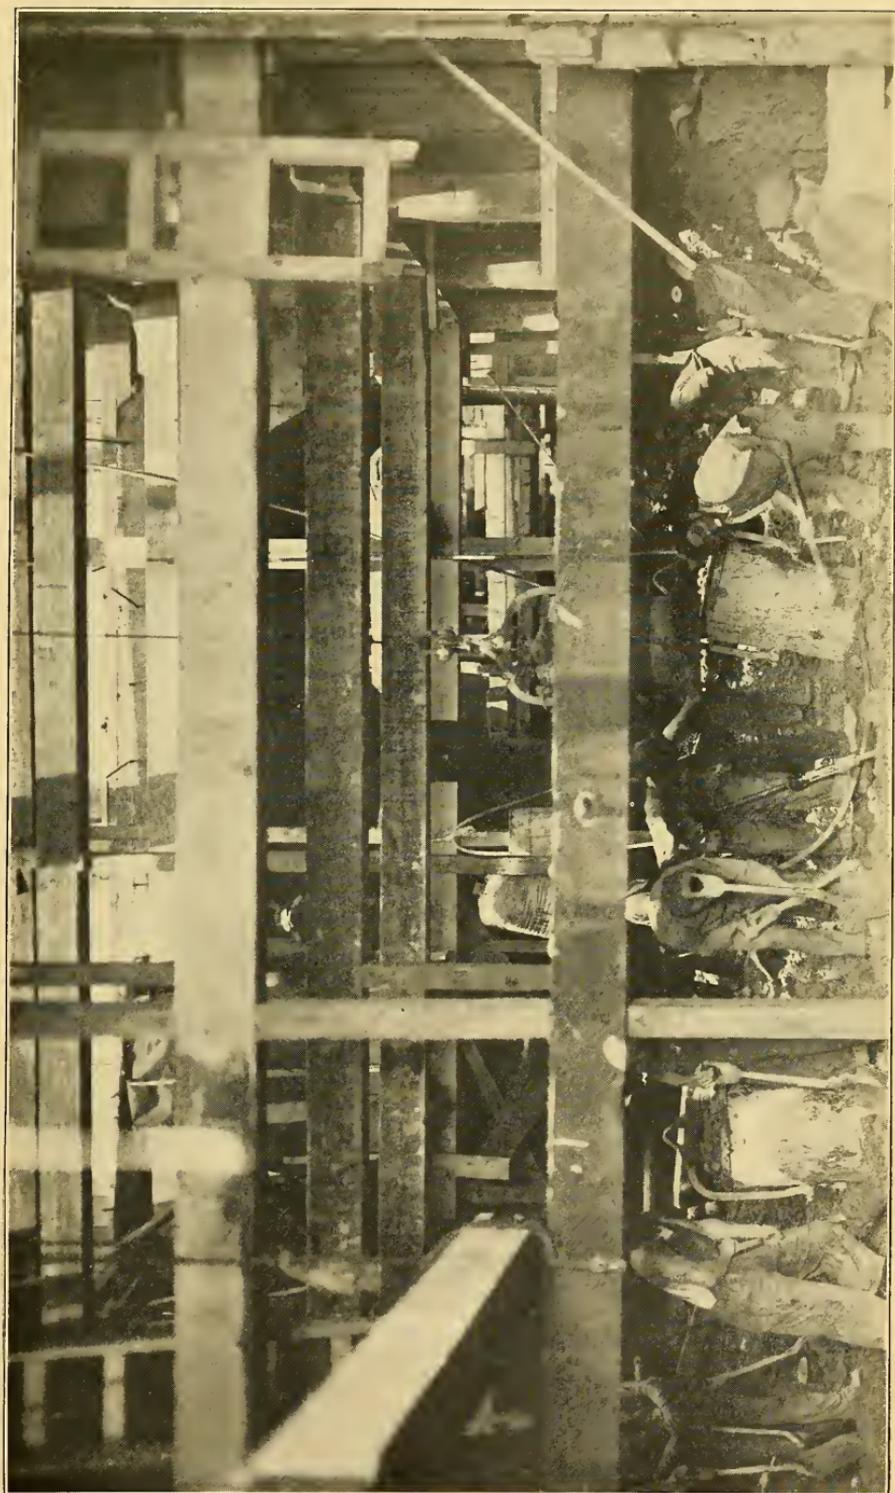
EXCAVATION WORK — MAVERICK SQUARE
